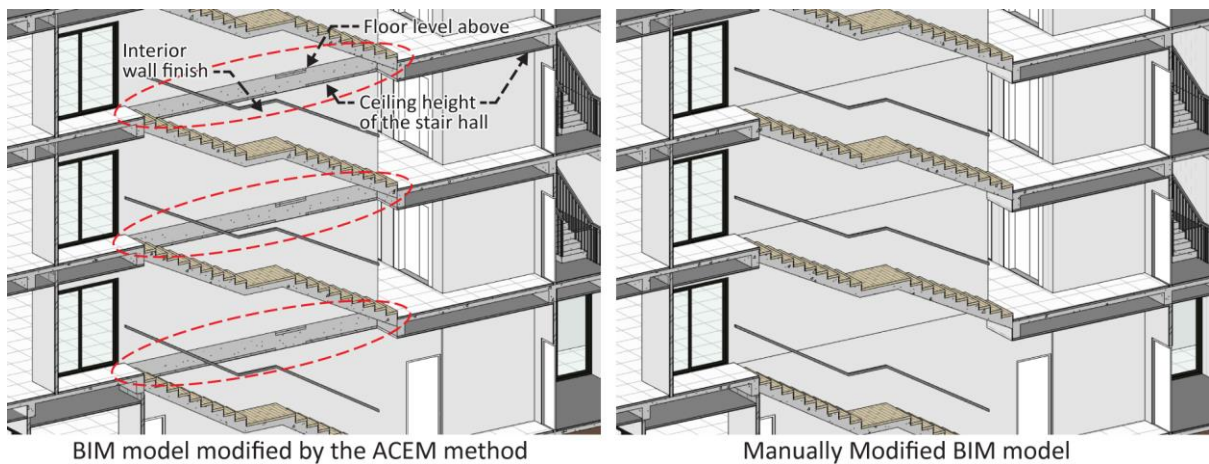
The height of the walls that are interior wall finish at the stairways was equal to the ceiling height of the stair halls, while in actual construction, the height of the walls must reach the floor level above.
